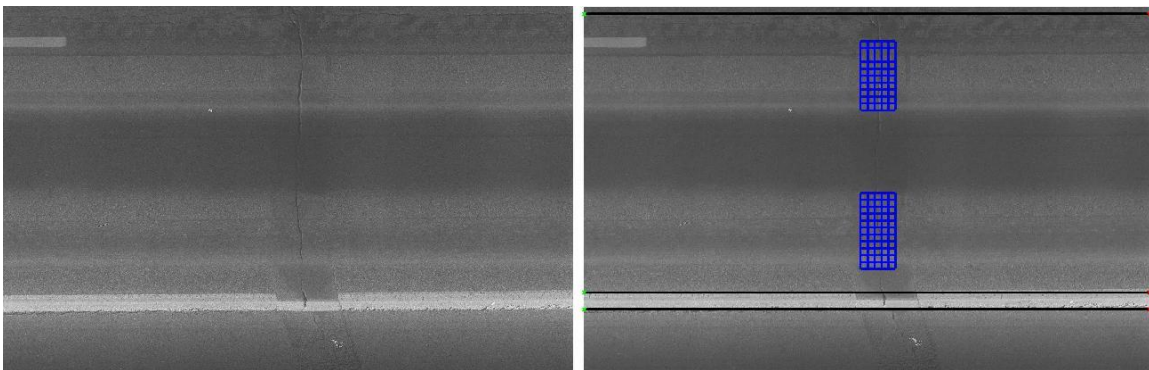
Example 1 of high-severity asphalt pavement crack: raw crack (left) and crack detection (right)
